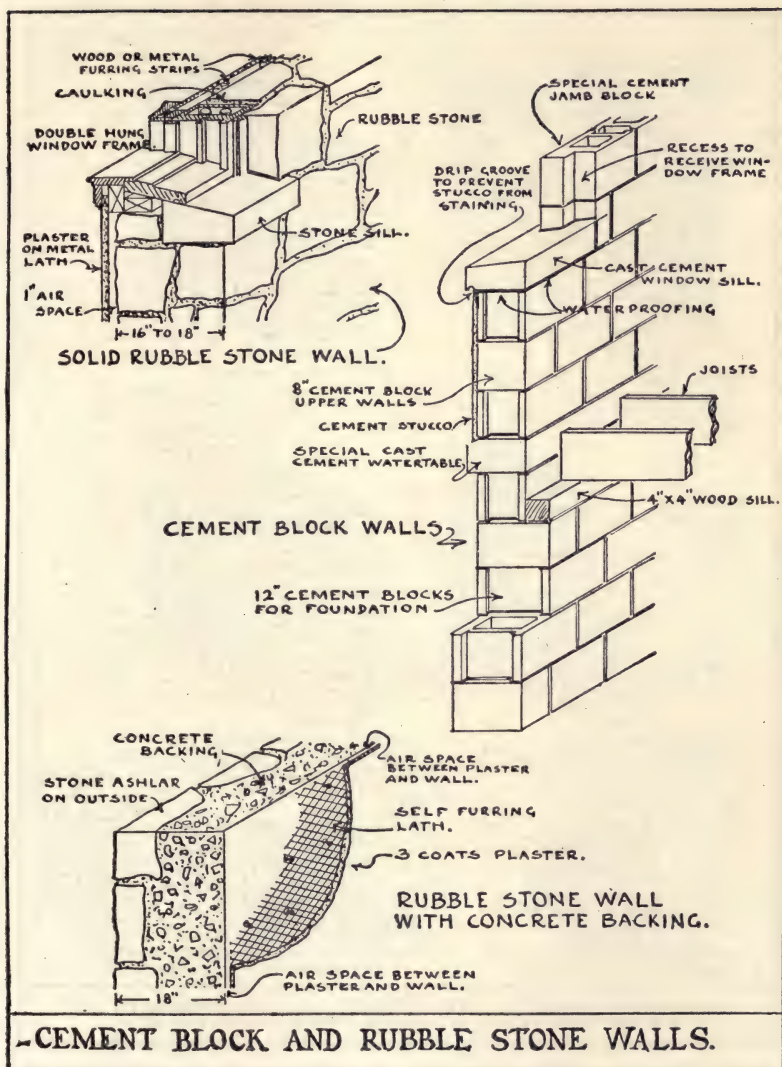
Economy in the use of stone depends upon whether it is plentiful in the locality. Furring provides an air space for protection against dampness. Cement blocks with special facings may be used without stucco. Avoid imitations of rough stone faces or raised panels.
